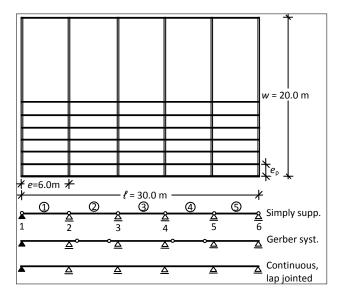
Schematic layout of evaluated structure and possible purlin systems
